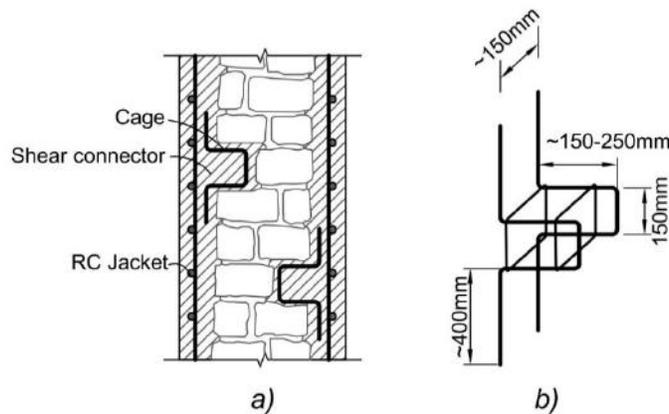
RC jacketing of masonry walls using shear connectors instead of steel anchors (based on UNIDO, 1983).
